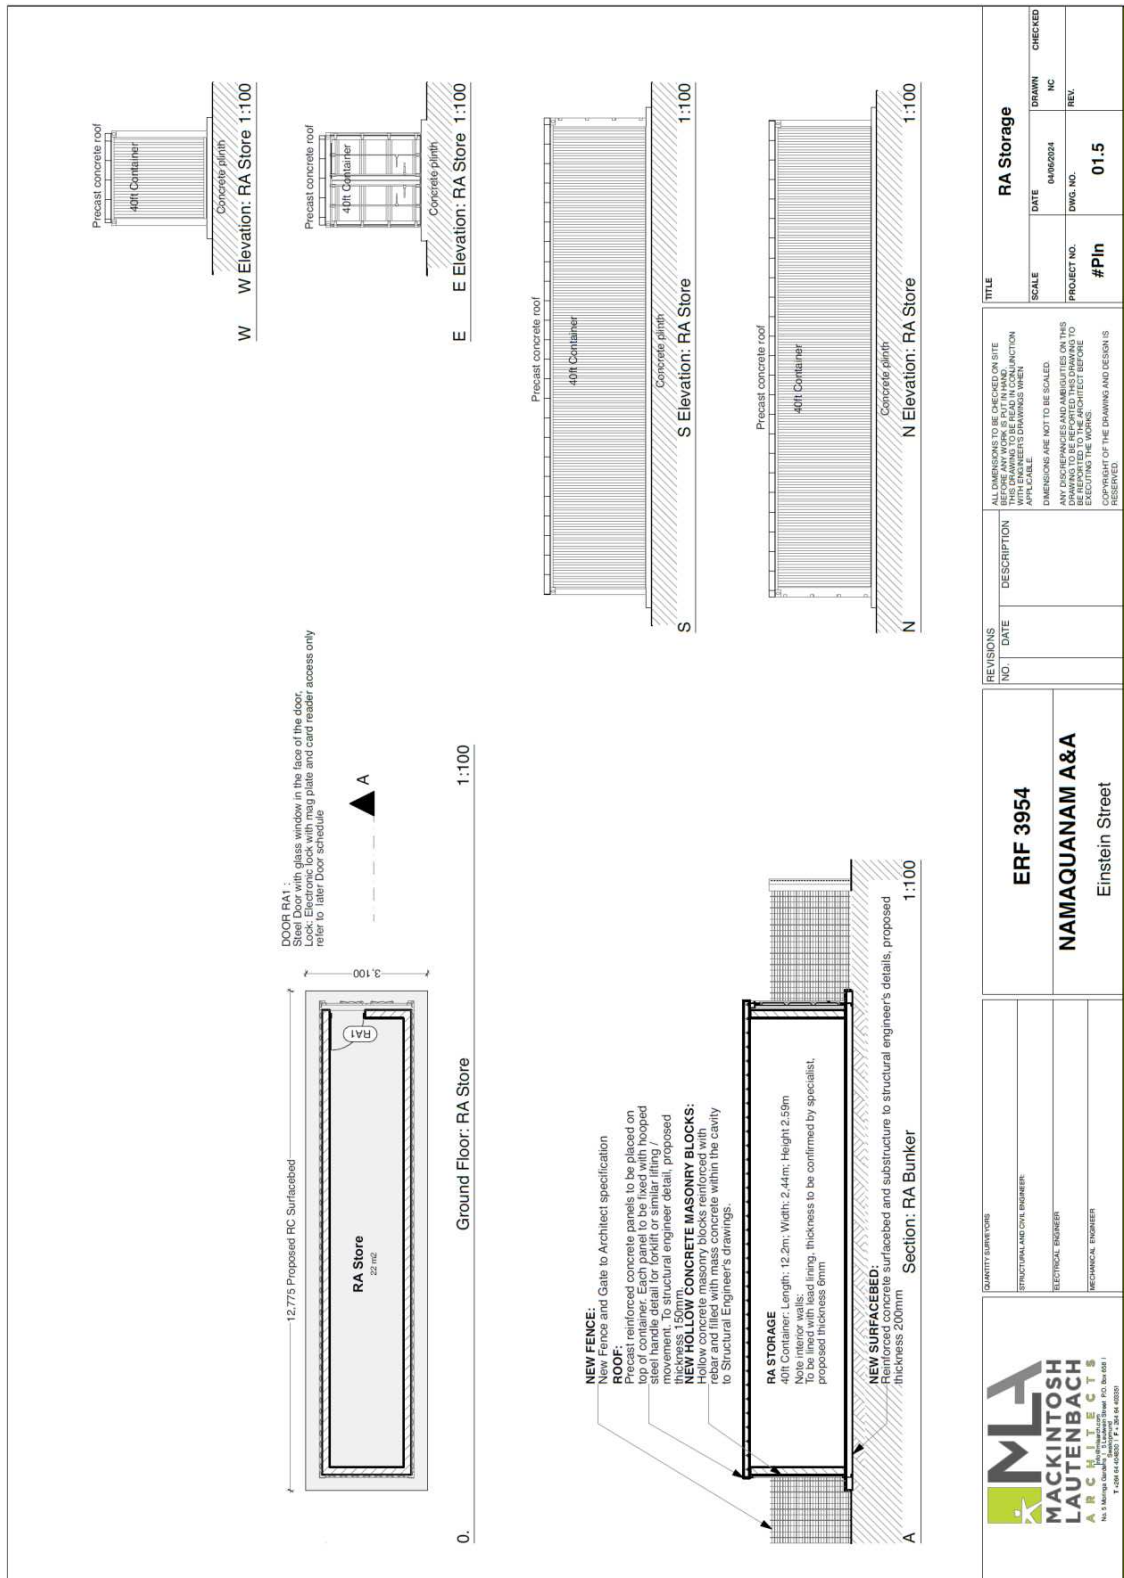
Architectural drawing of the above-ground storage facility option, consisting of a reinforced 12.2 m shipping container.
